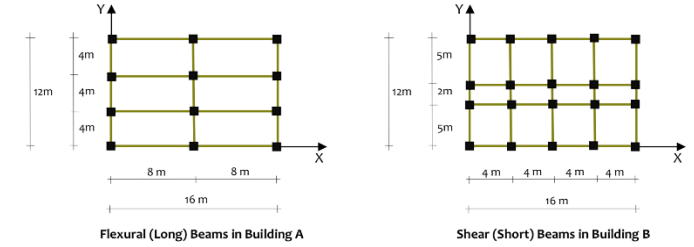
Effect of beam span: Long span beams resist load through flexure while short span beams through shear
